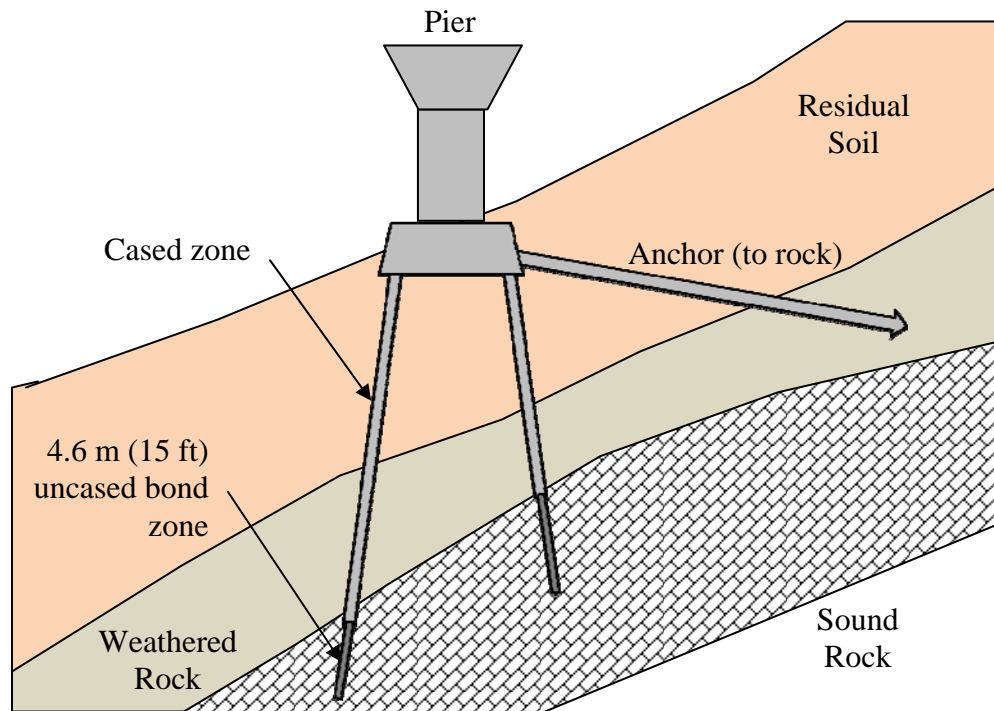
Micropile Foundation Design for a Typical Pier, Foothills Parkway Bridge No. 2
